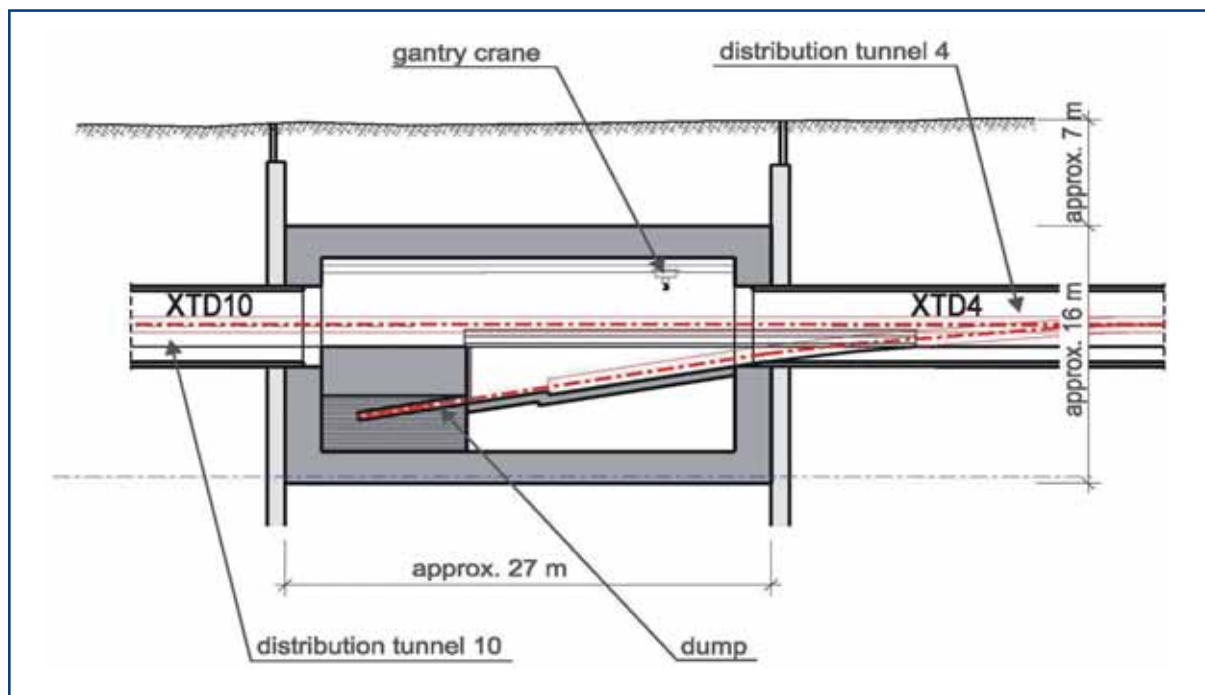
Side view of the beam absorber shaft building XSDU2. The electron beam is deflected downwards, the photon beam is unaffected and travels towards the experimental hall. In addition, the crane facility and the local concrete shielding of the absorber are shown.
